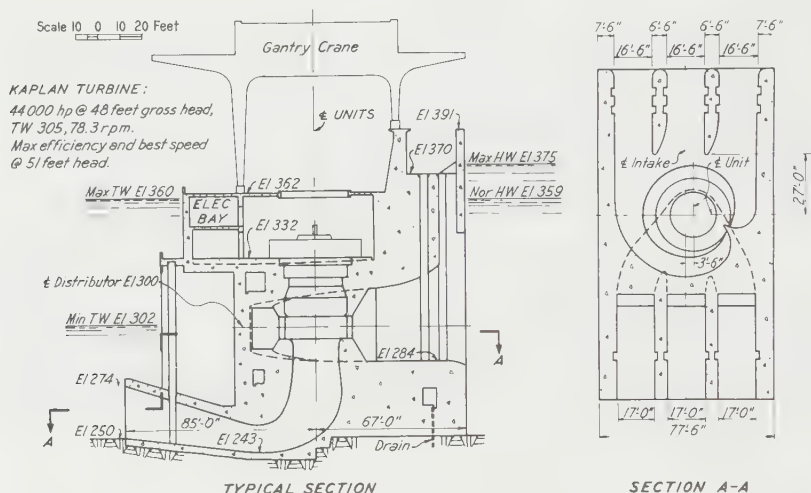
Semioutdoor plant, Kentucky Dam, TVA.
